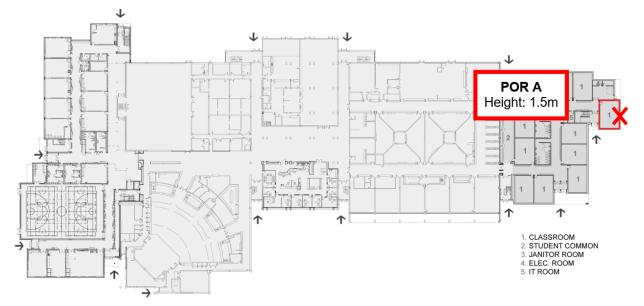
Floor plan section of 1st floor showing the plane of window (POW) point of reception, with the location of POR A. The room associated with the POR is outlined in red. The red 'X' denotes the receiver location used in STAMSON.
